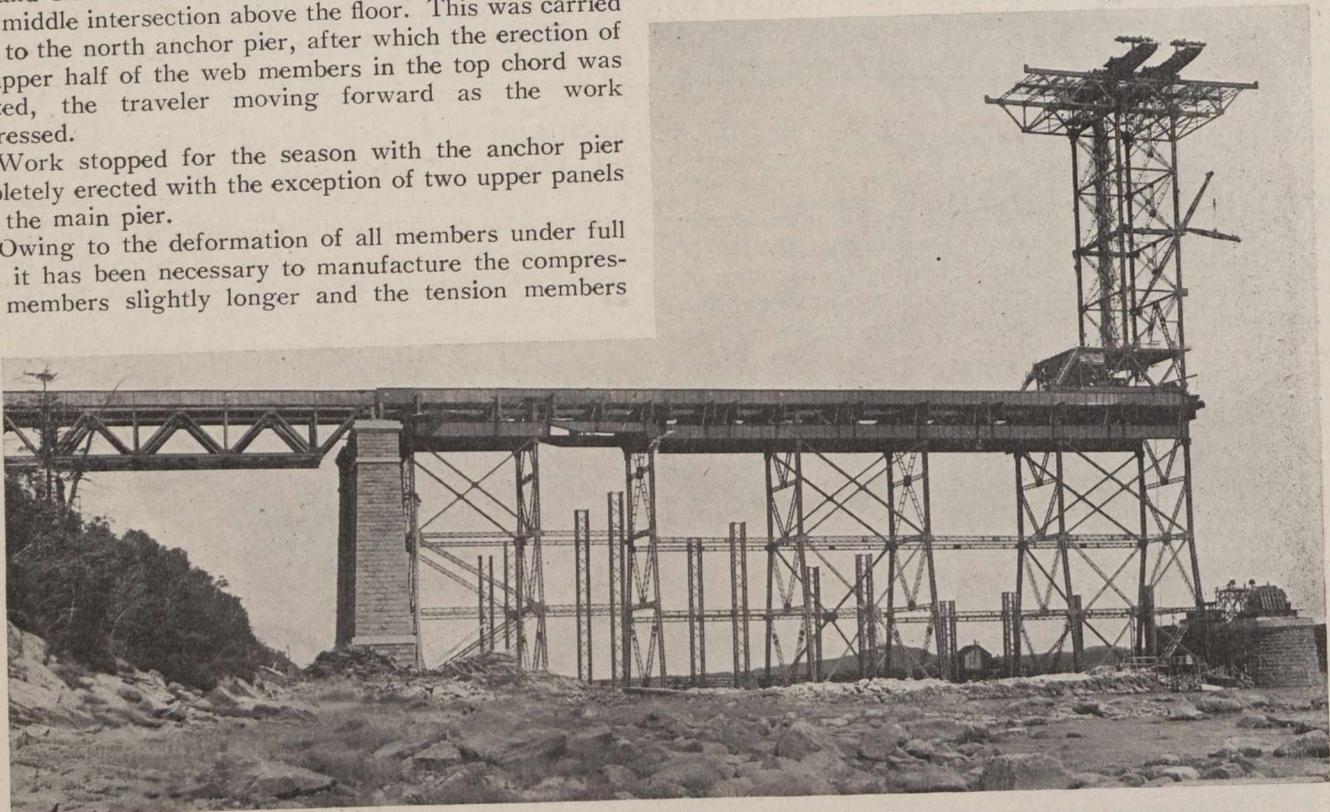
Falsework and Floor Erected, and a Start Being Made on the Erection of the Main Shoes.
